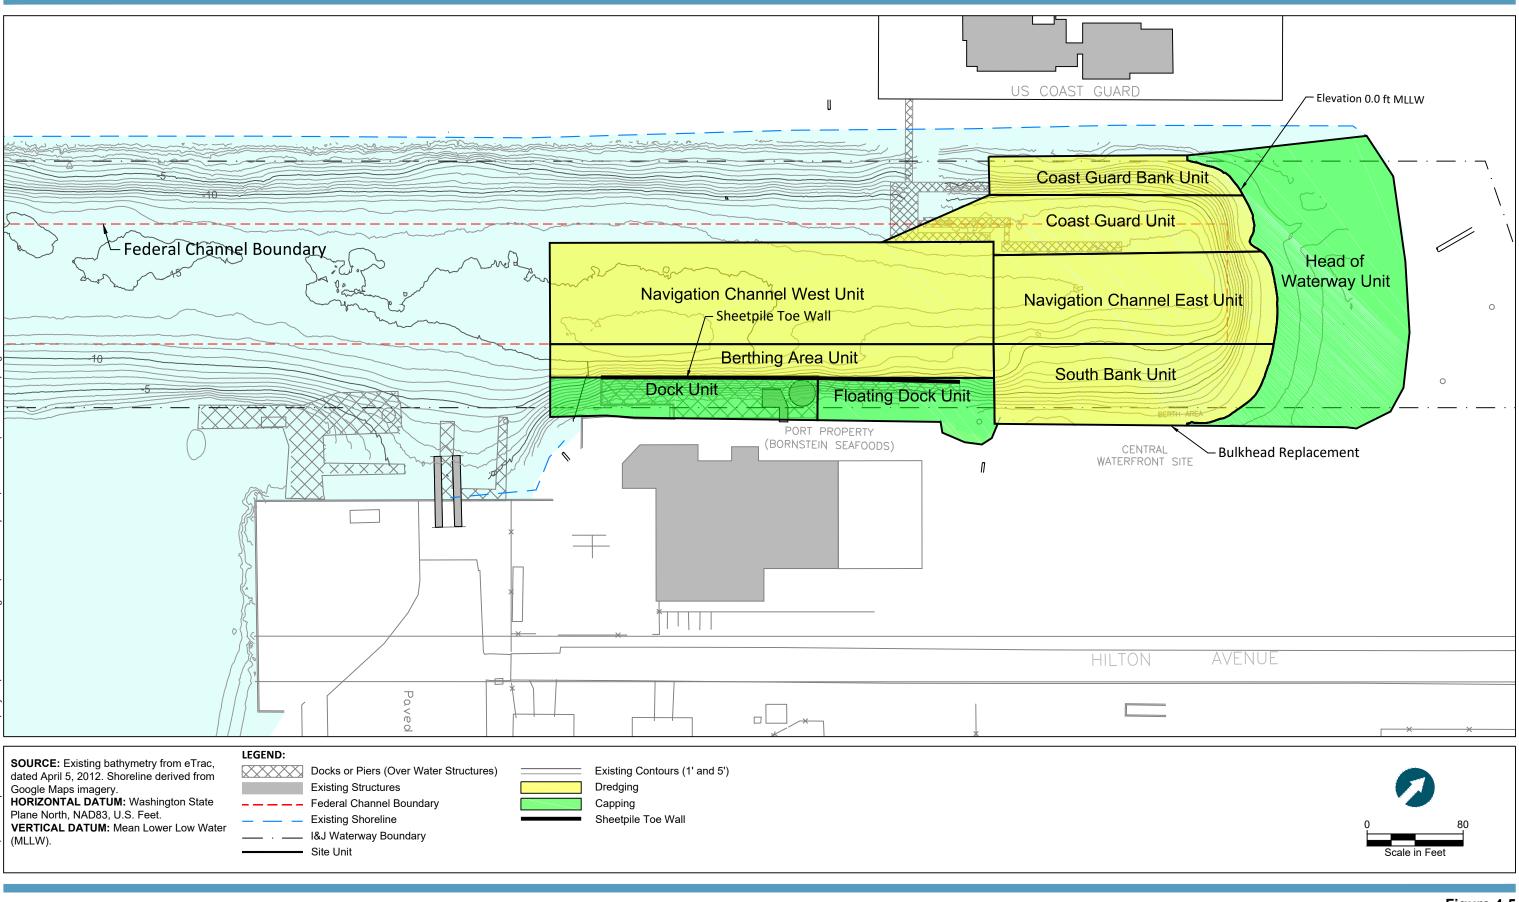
Alternative 5 Cleanup Action Plan I & J Waterway Site Port of Bellingham
